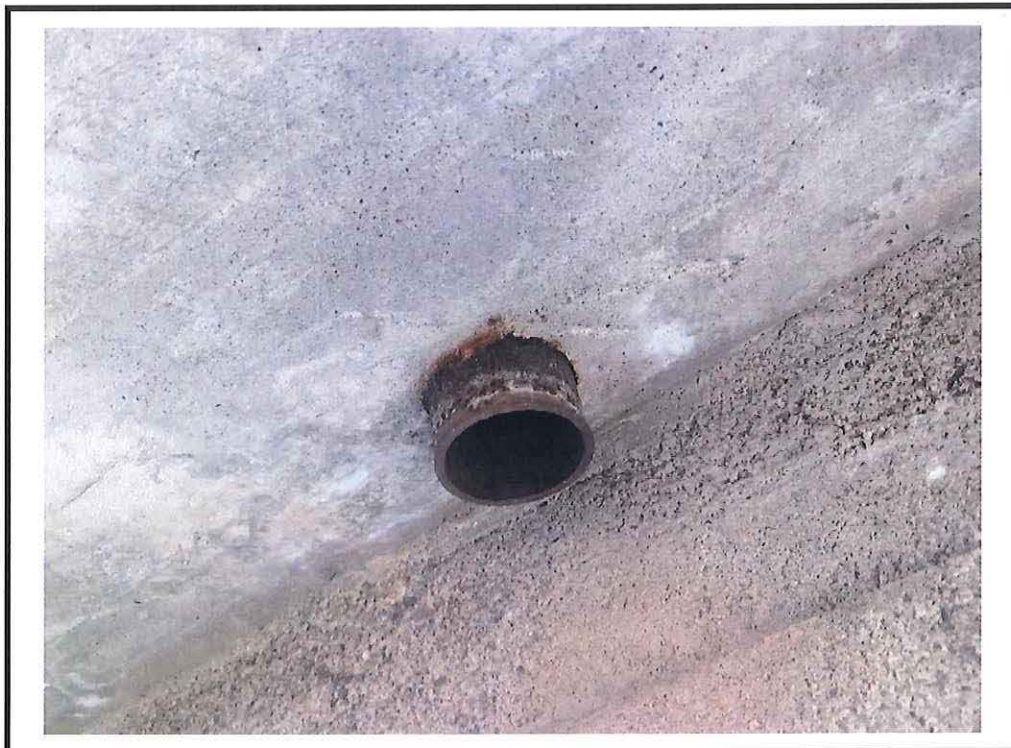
Corrosion and perforation noted at deck drain (Typical)
